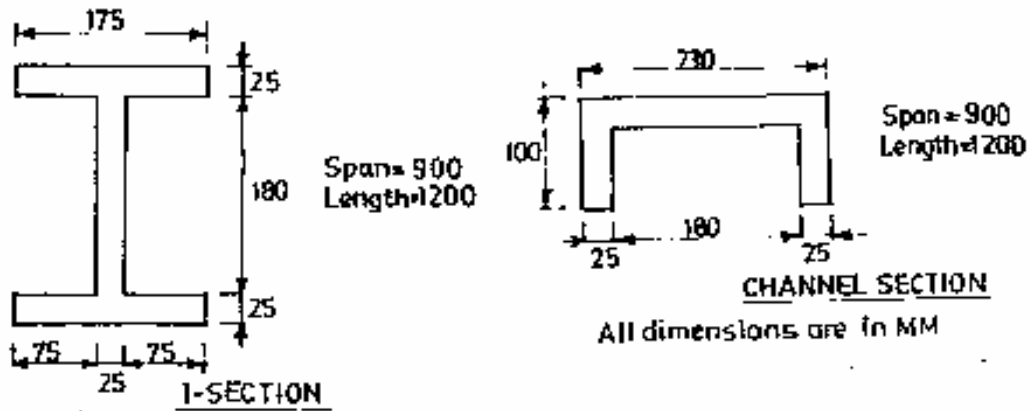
Cross Sections of Flyash Ferrocement Beams
